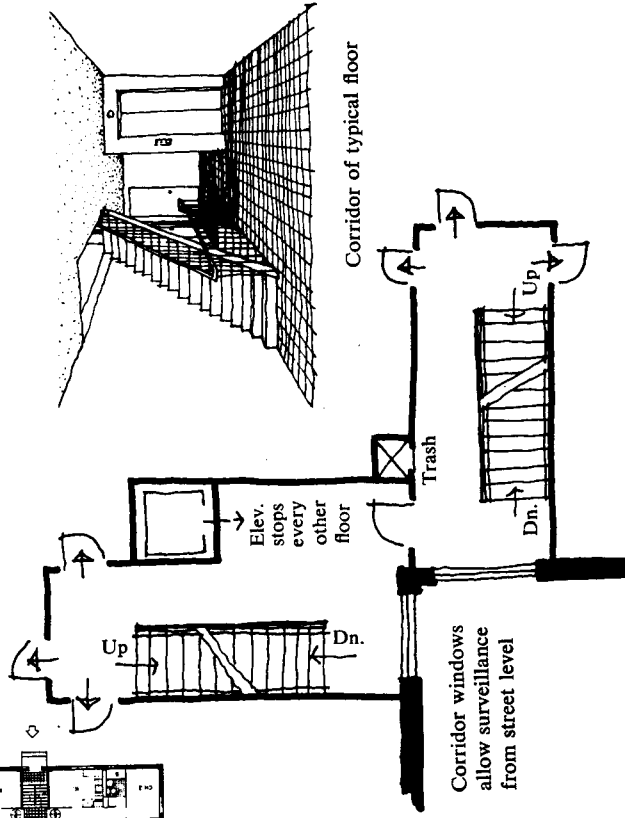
View of Interior Corridor of Brownsville Houses. Corridor plans show clustering of apartment entries around open stairwells.
